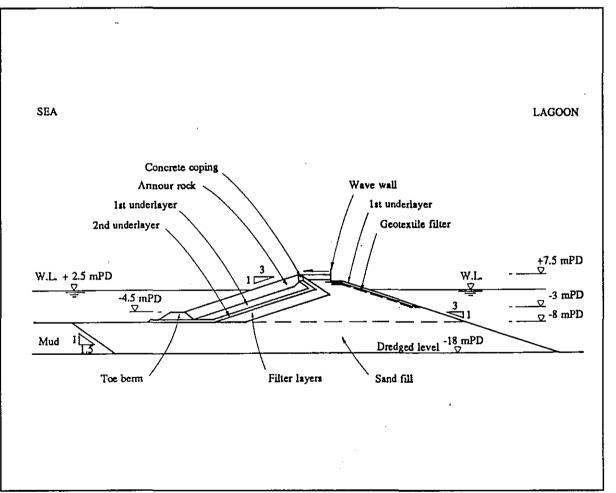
Trapezoidal Perimeter Section (Embankment)
